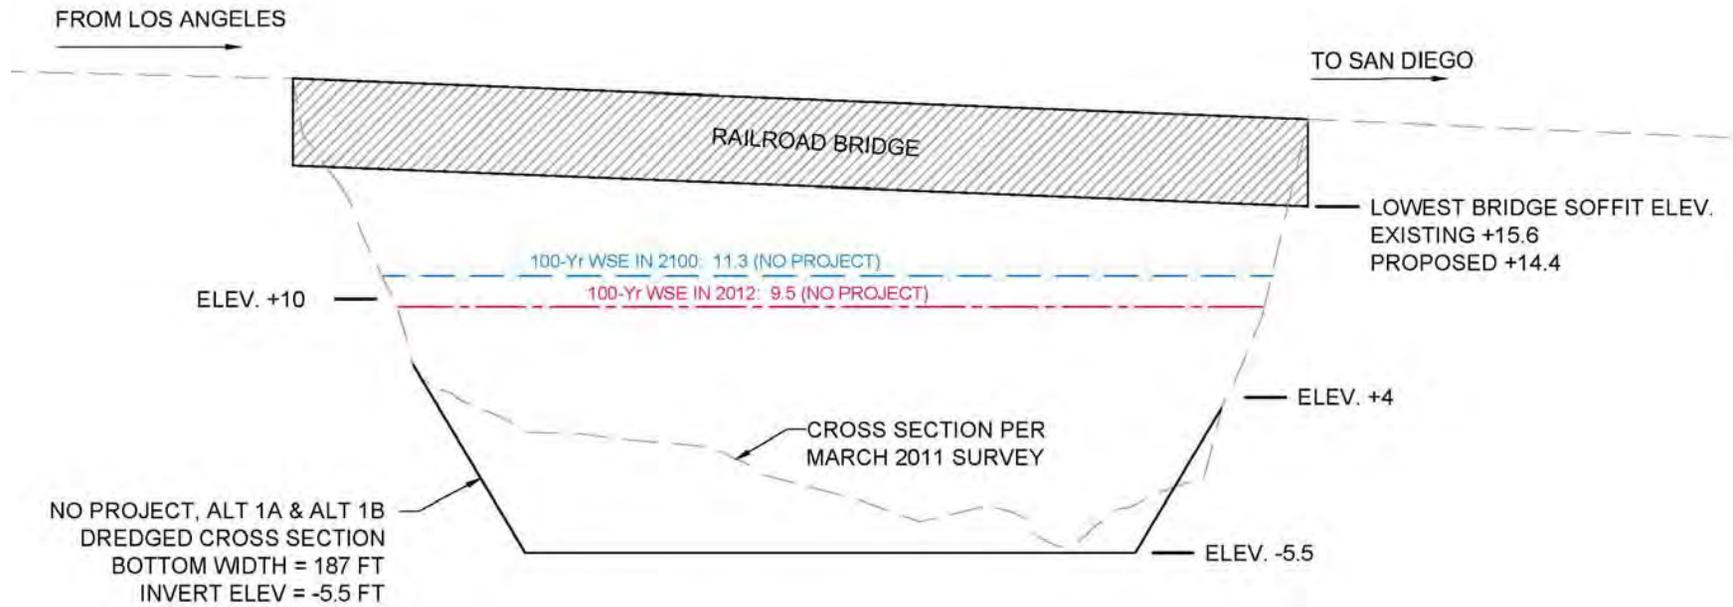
Existing Railroad Bridge Channel Cross-Section
